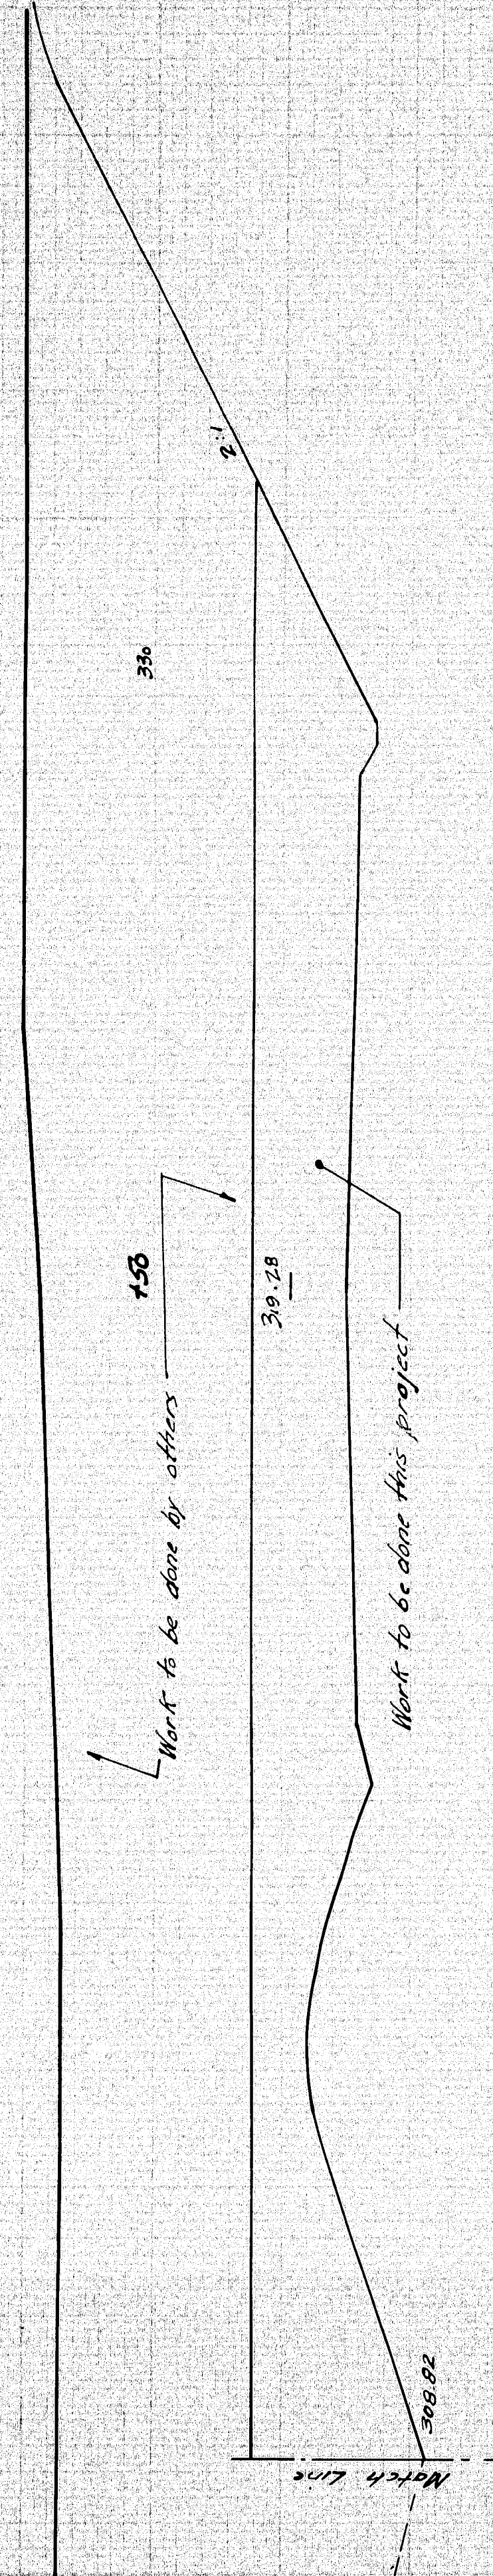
CROSS SECTION (A, B, C, D, E)
